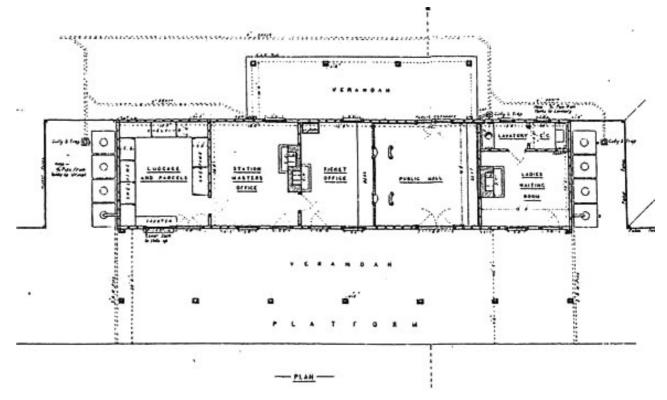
Floor plan from contract drawings for the Bridgetown Passenger Station House
